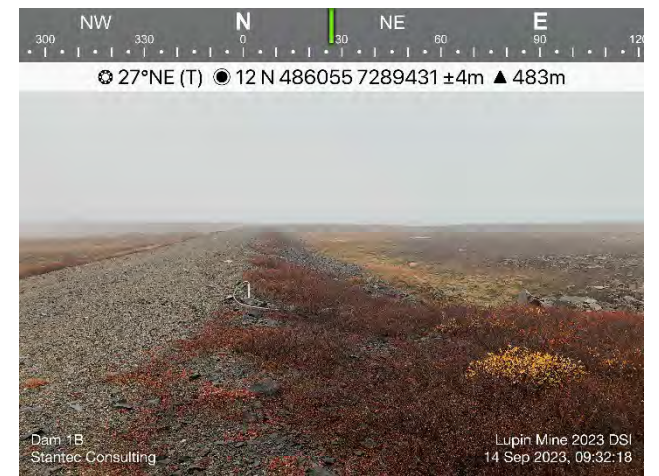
Overview of the crest and upstream embankment at Dam 1B.
